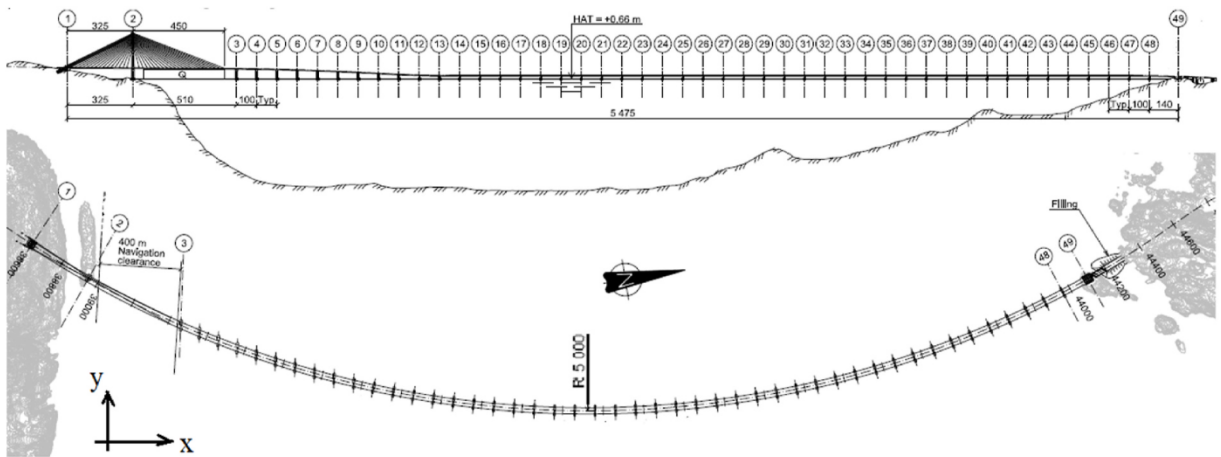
Overview of the BFB (top: elevation view, bottom: plan view). Units are in meters.
